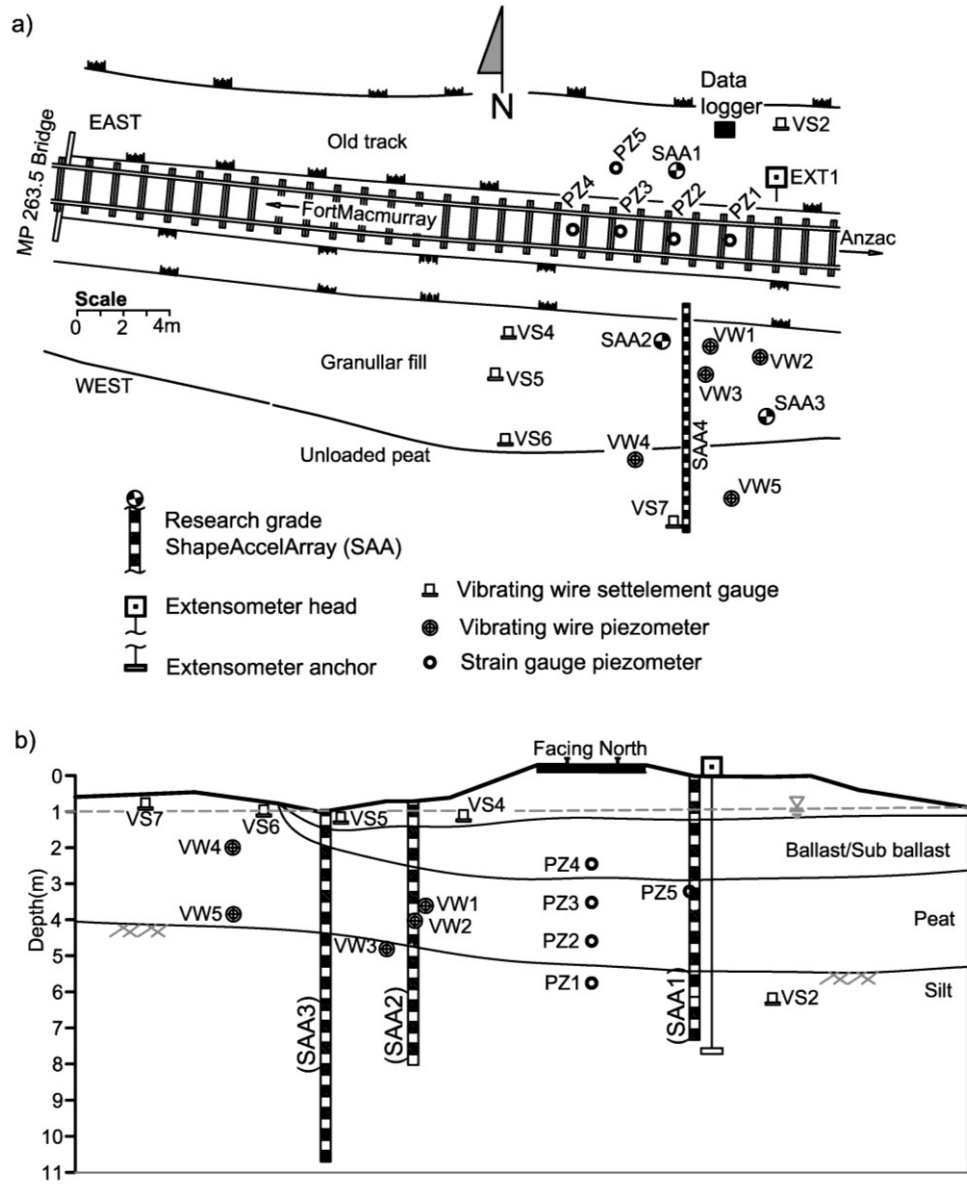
Plan and sectional elevation of study site and instruments installed at MP 263.5.
